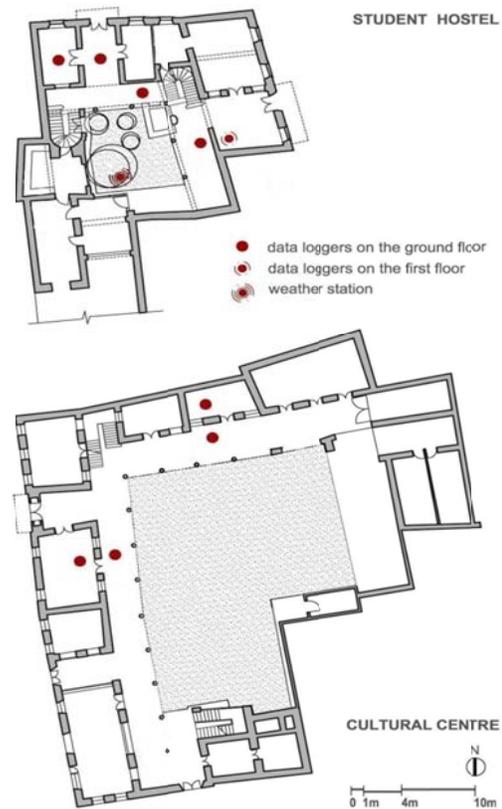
Plans of the buildings under study showing the indoor and outdoor measuring points.
